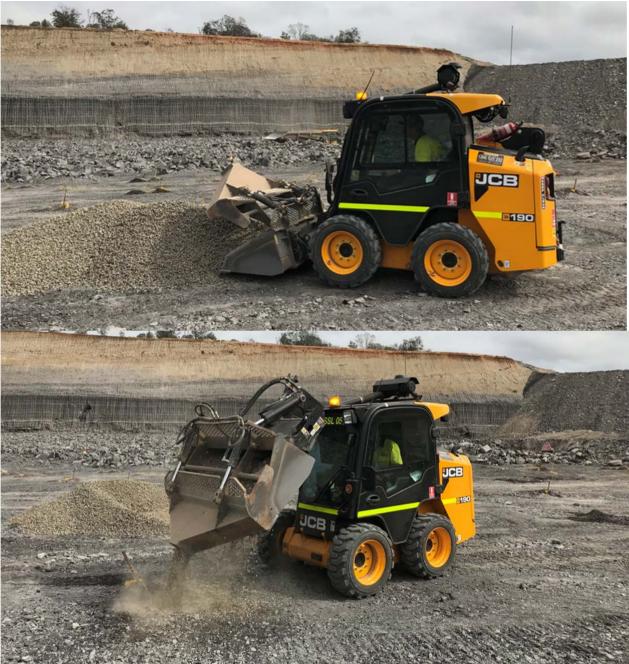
Engineered attachment on Bobcat to reduce spillage and dust when stemming holes
